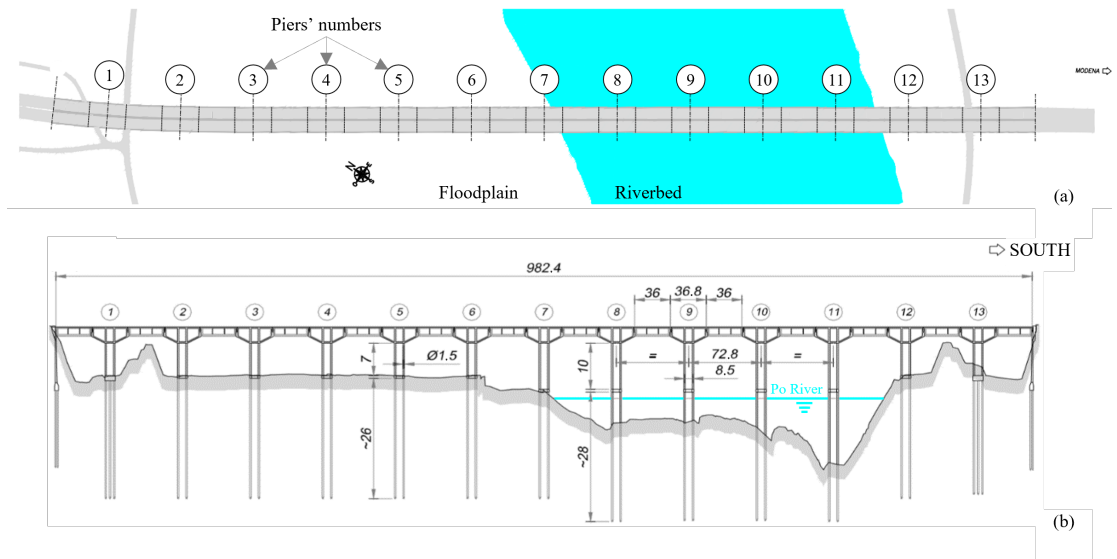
(a) Plant and (b) elevation of the A22 Po River Bridge. Dimensions in meters.
